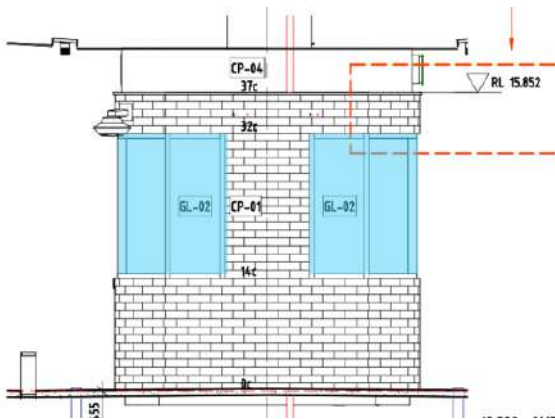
ELEVATION OF THE STAFF OFFICE
